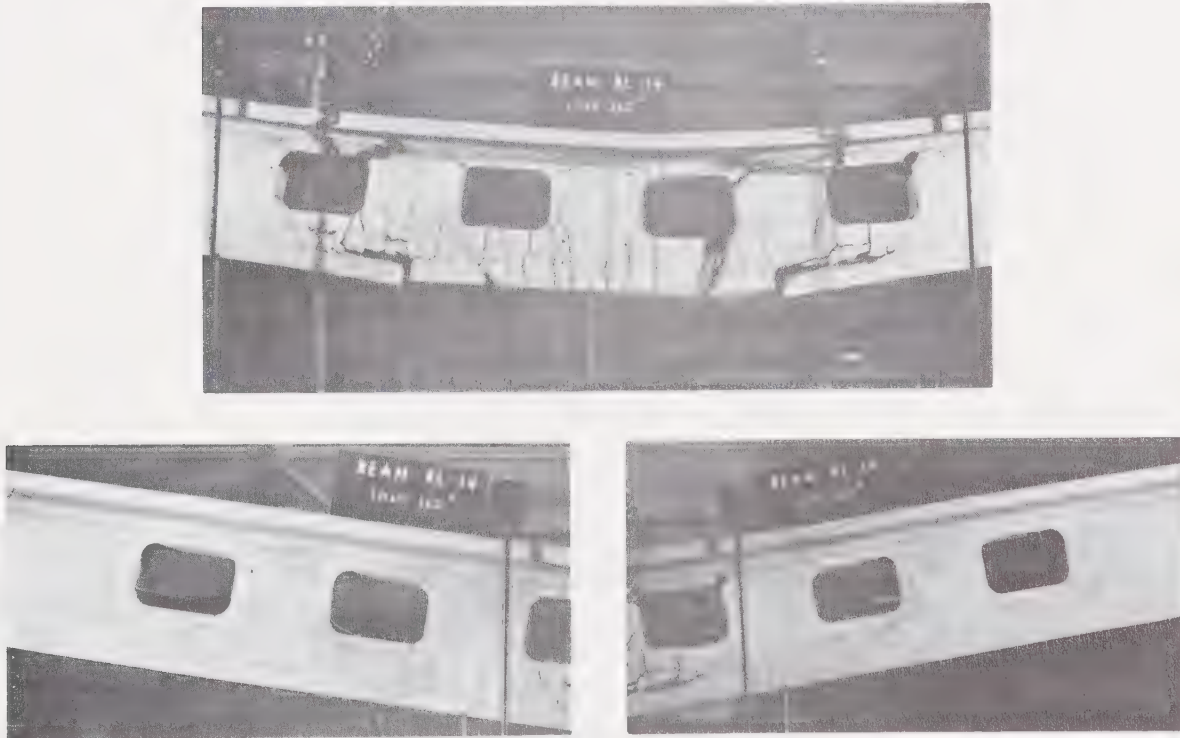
CRACKING AND FAILURE PATTERN OF BEAM 14-12-6
